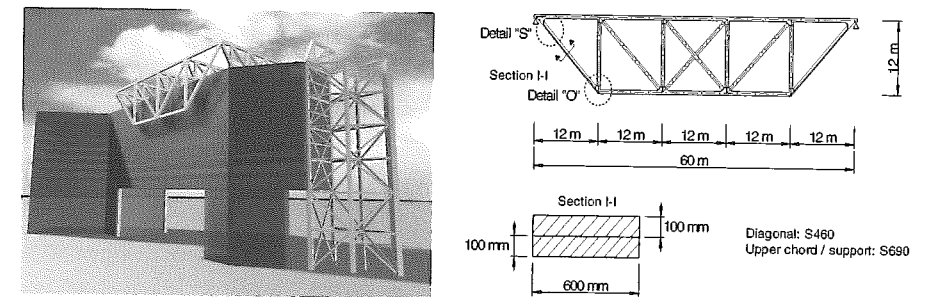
Overview on the roof truss of the Sony Centre in Berlin, Germany
